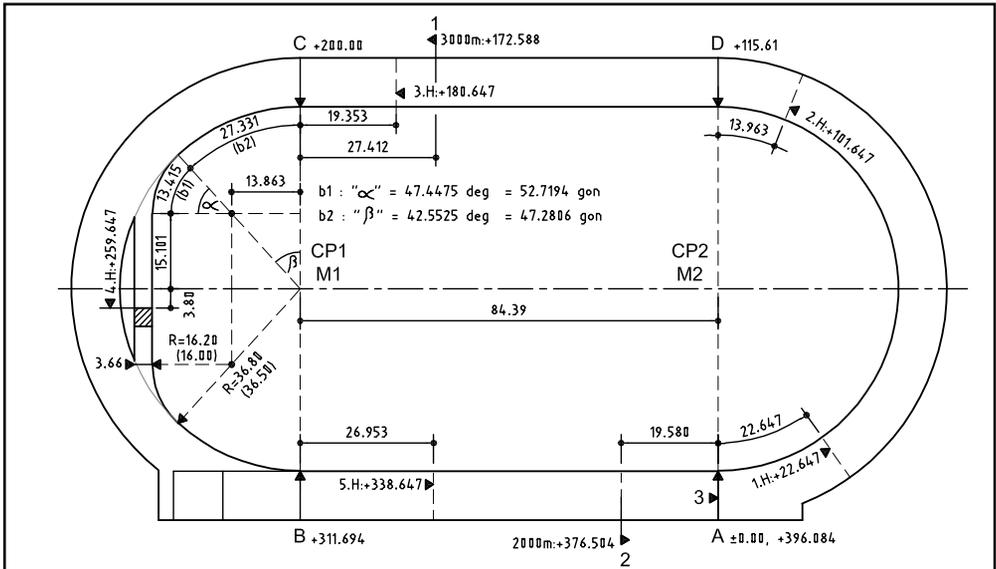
Steeplechase track with water jump inside the bend of 400m Standard Track without a fixed kerb (Dimensions in m) (see Appendix Chapter 2)
